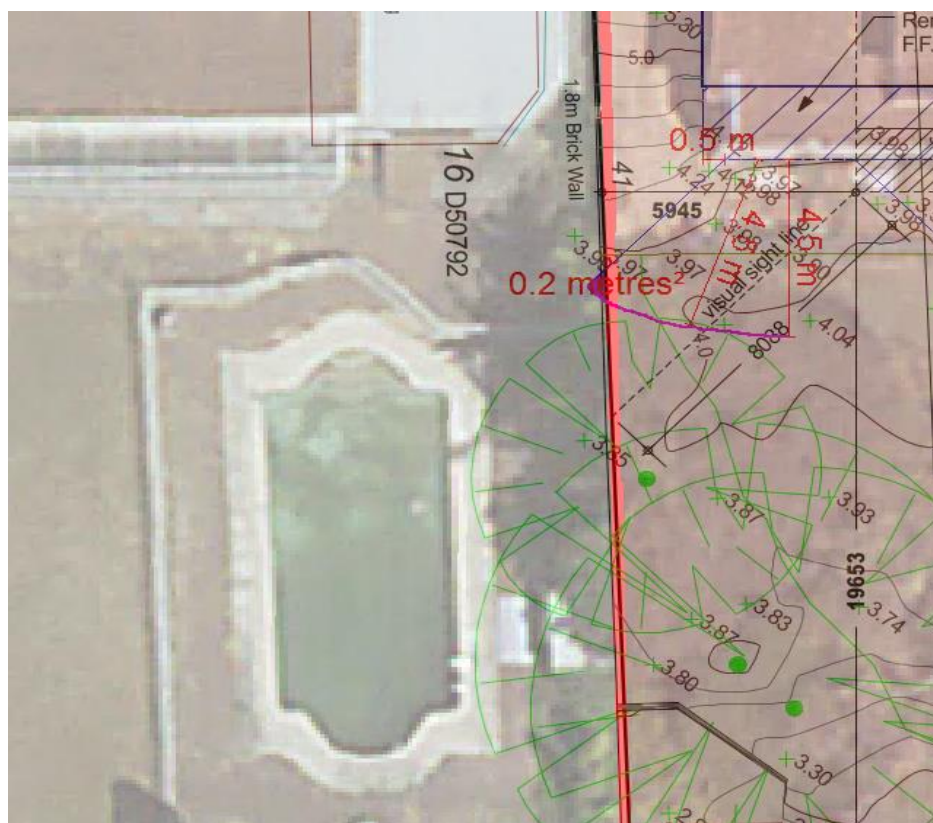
Aerial of Proposed Refurbishment against Existing Development
